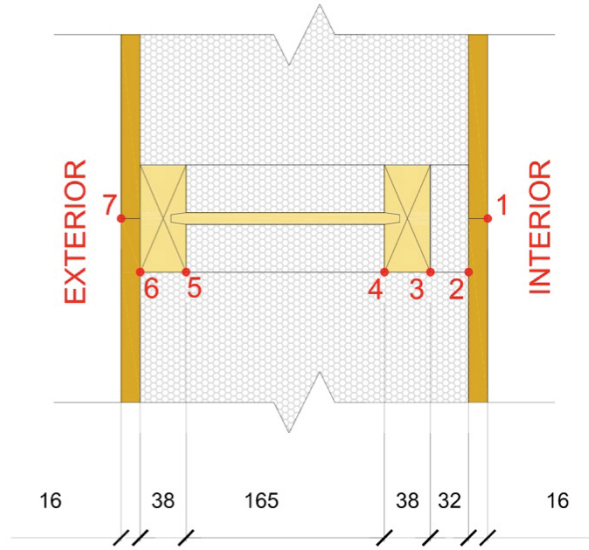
Sensor placement for joint type H (dimensions in mm)
